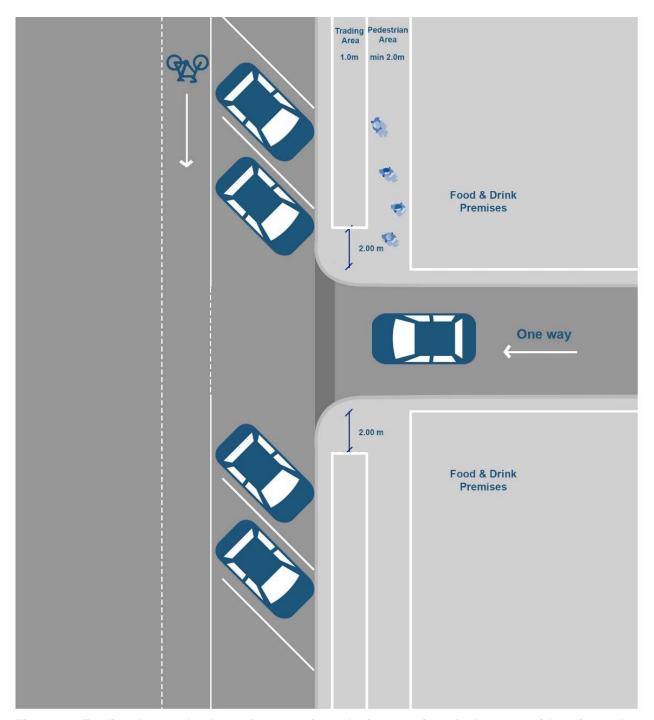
Trading Area setback requirements from the intersection of a laneway with main road
